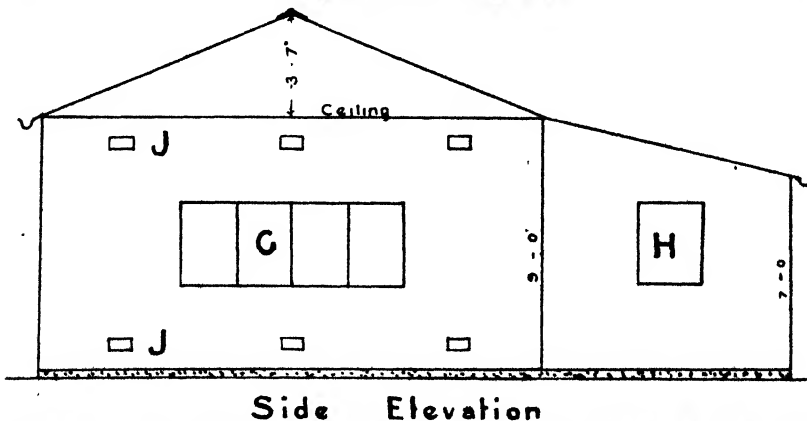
Side elevation incubator and battery brooder house. (G) Casement windows 8ft. by 8ft.
